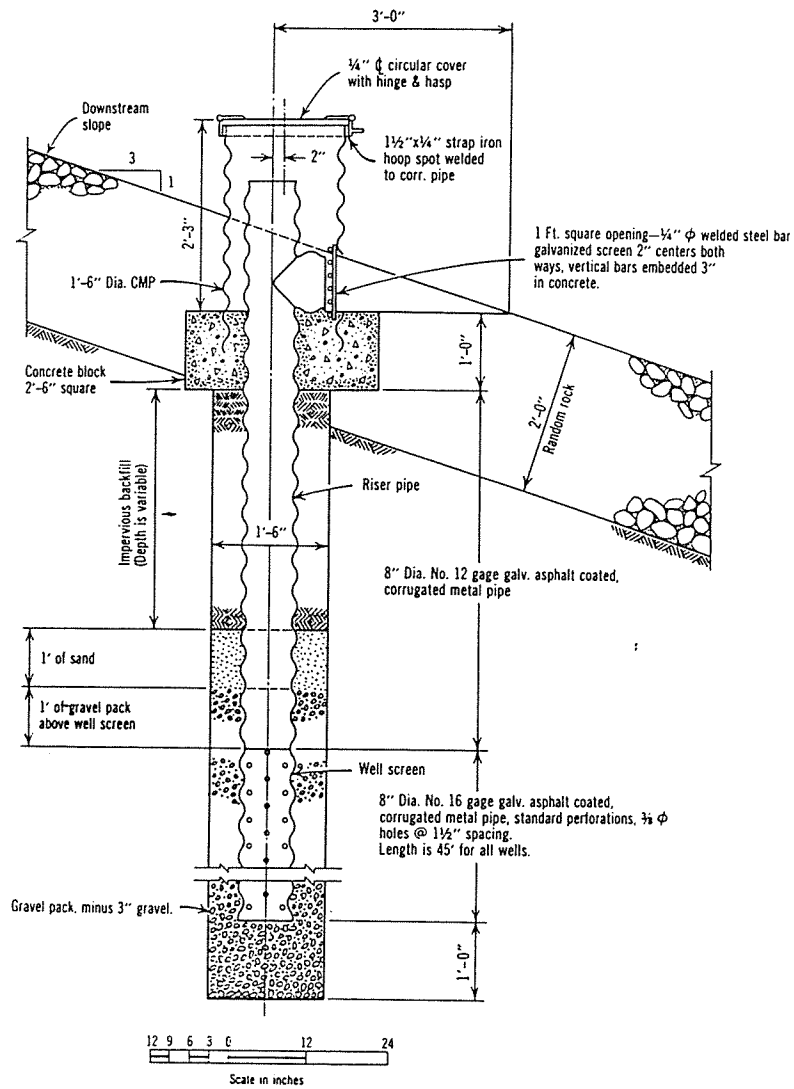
Relief well detail—Success Dam. (Courtesy Sacramento District, U.S. Army Corps of Engineers)
